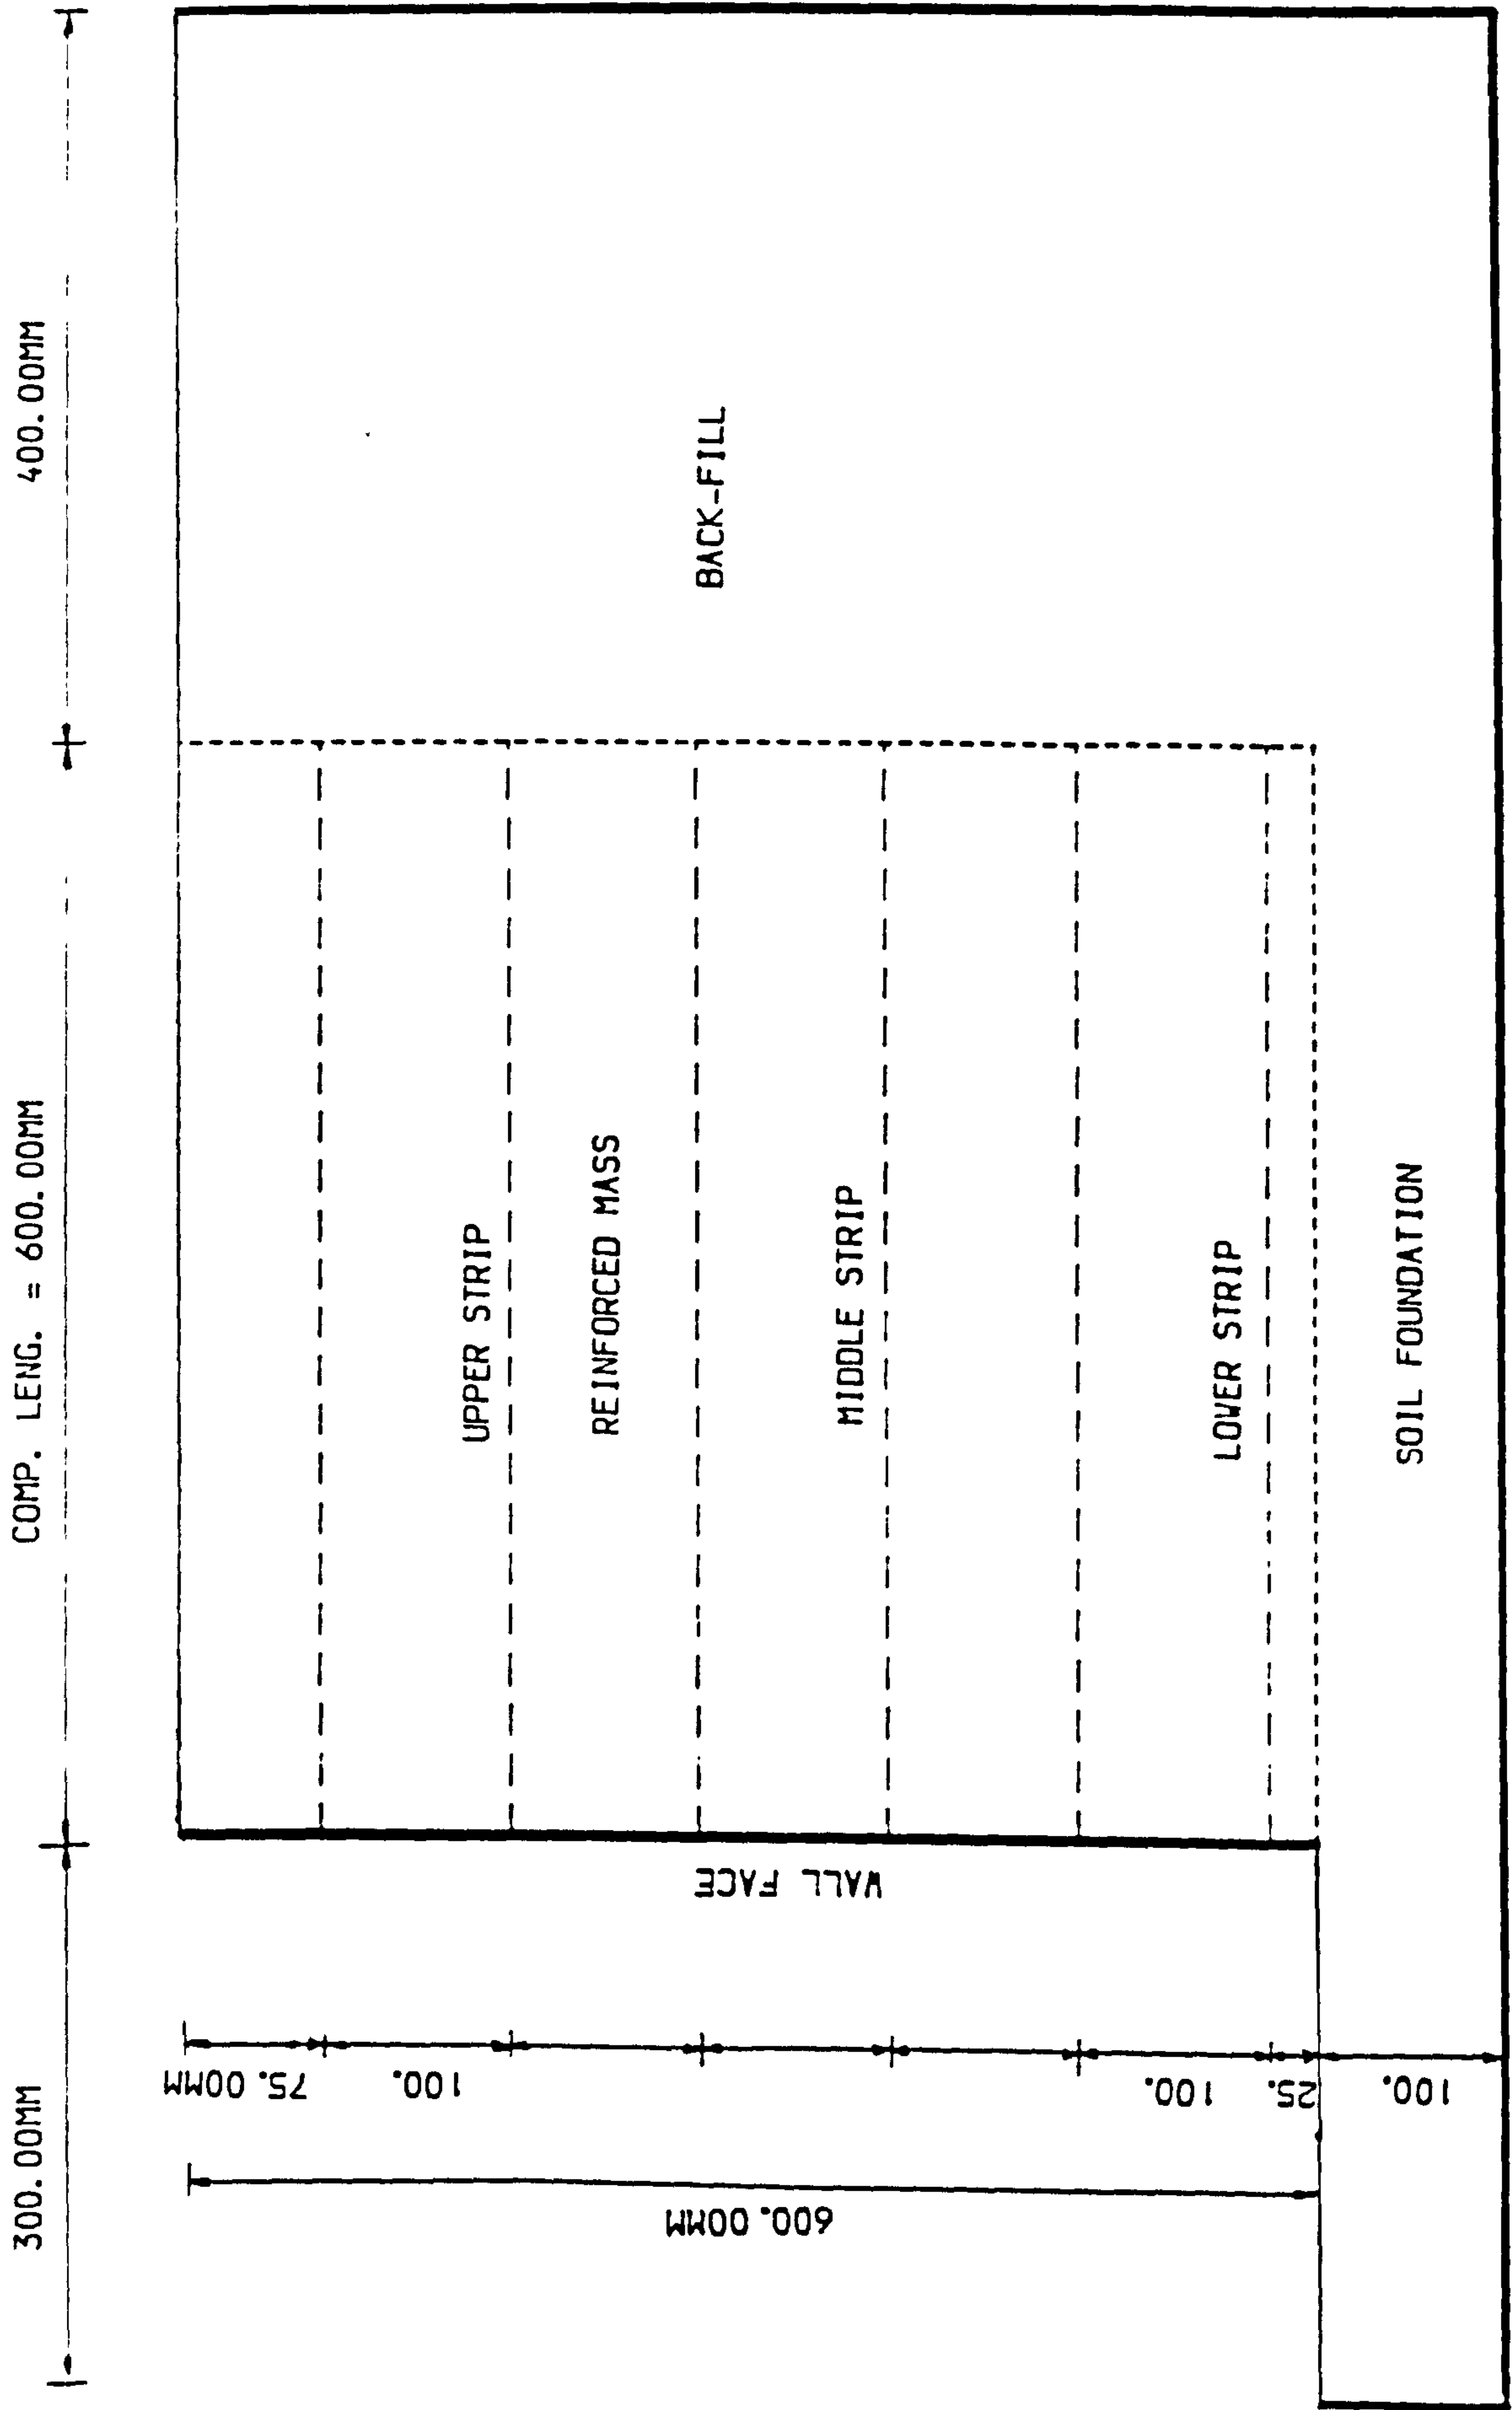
THE MODEL REINFORCED EARTH WALL.
